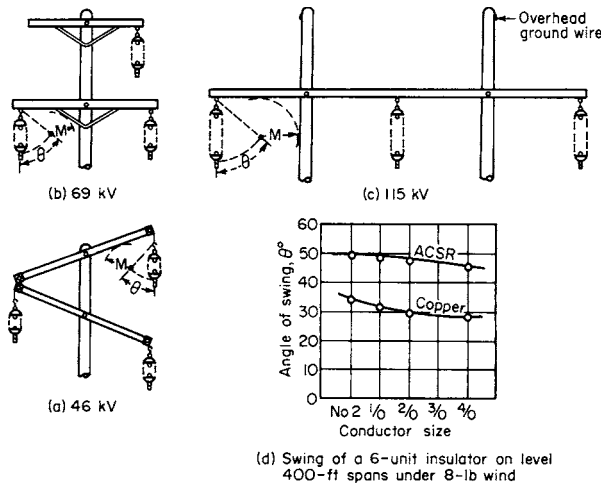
Typical suspension-insulator arrangements on wood construction.
